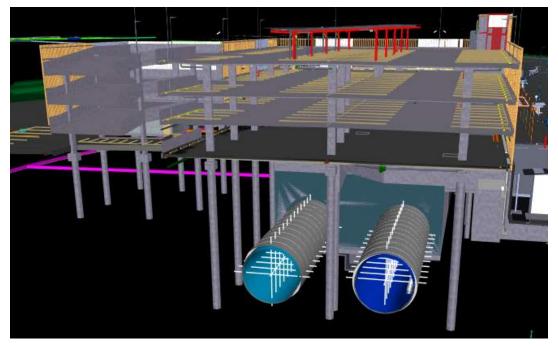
Section cut through the BIM model showing the car park structure and foundations in relation to the twin rail tunnels, looking towards the west.
